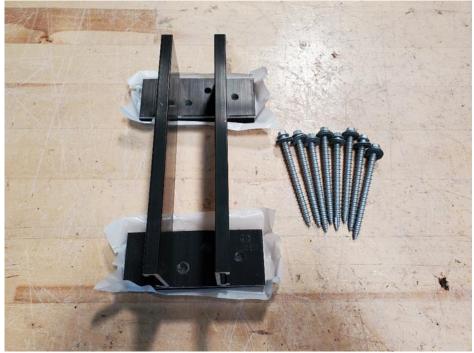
Unassembled Test Specimen (including 8 screws, 1 flashless slide assembly)
